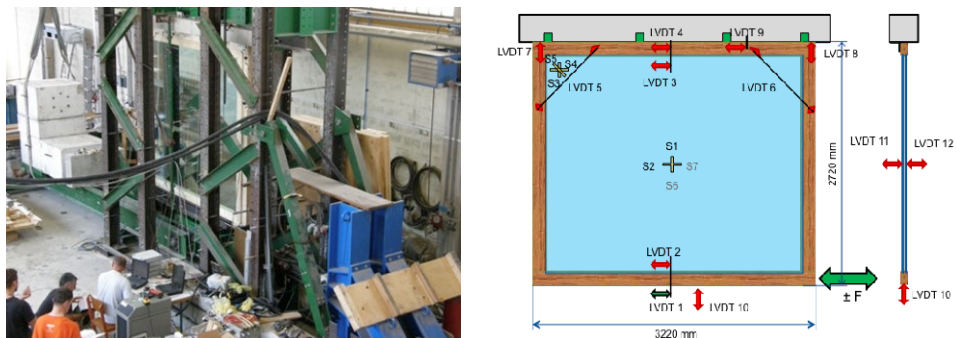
Cyclic racking test of glass-infilled timber frames and scheme of instrumentation
